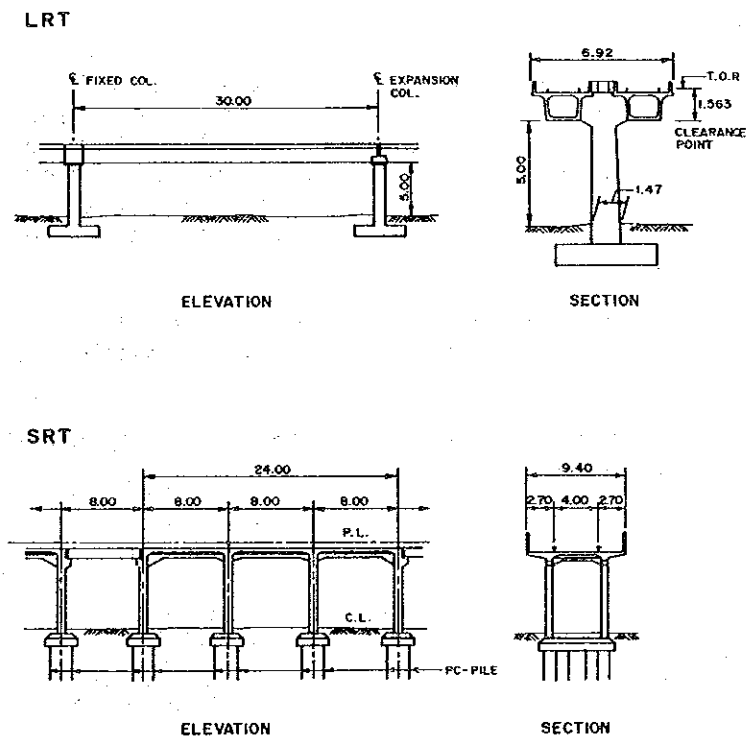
Assumed Typical Sections of Rail Transit Systems
